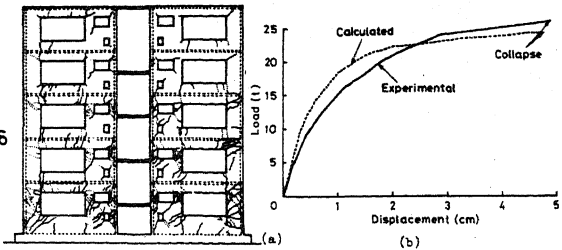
Full-Scale Test Results of a Shear Wall Type Apartment
